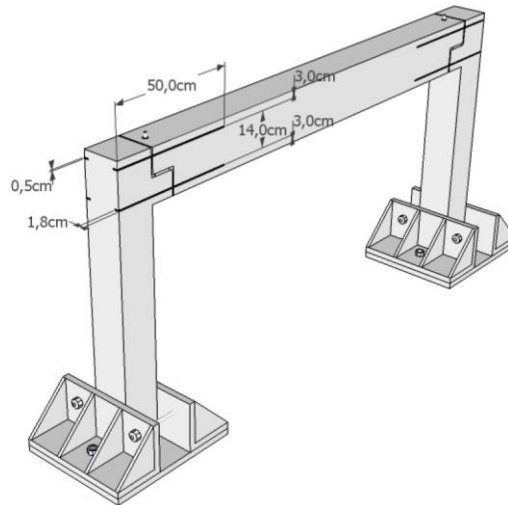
Precast beam-to-column connections retrofitted by NSM CFRP strips (da Fonseca et al. 2011)
